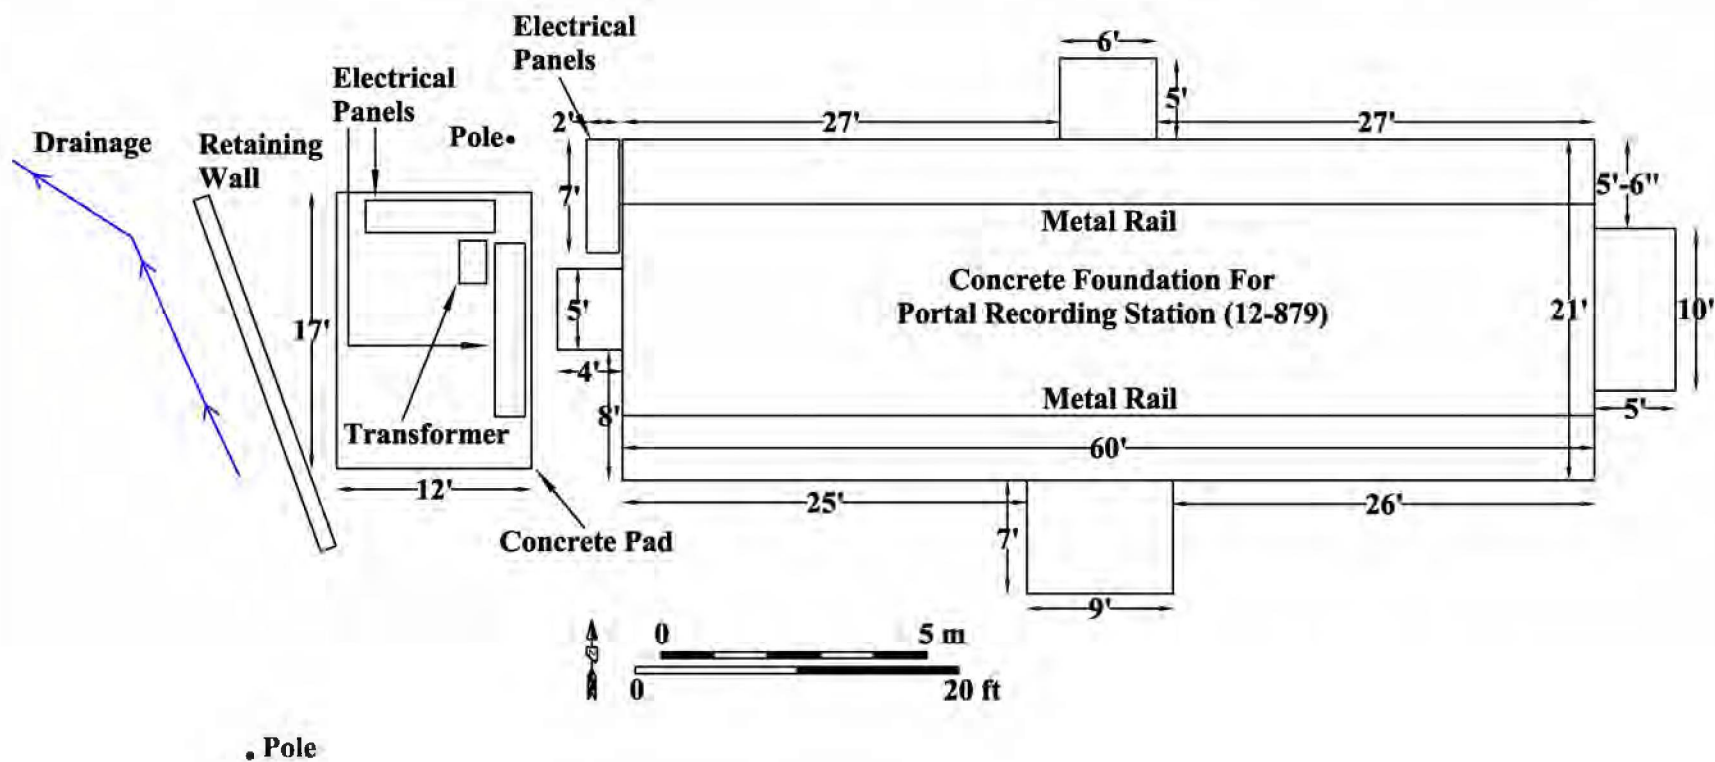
Plan view of Feature 10, portal recording station, U12n Tunnel.
